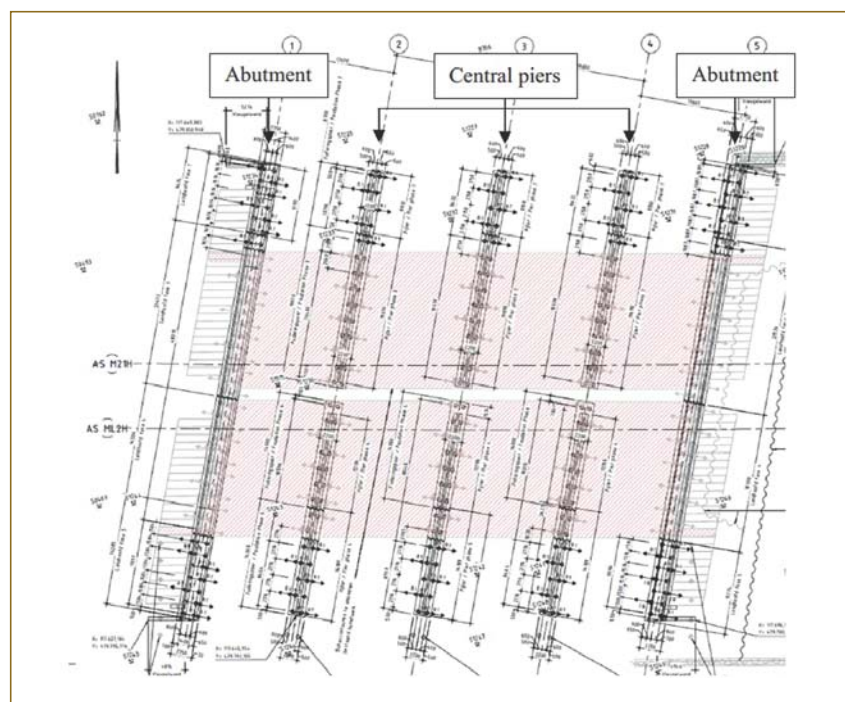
Plan view Pile plan + Foundation (Existing civil structure outlined in red).
